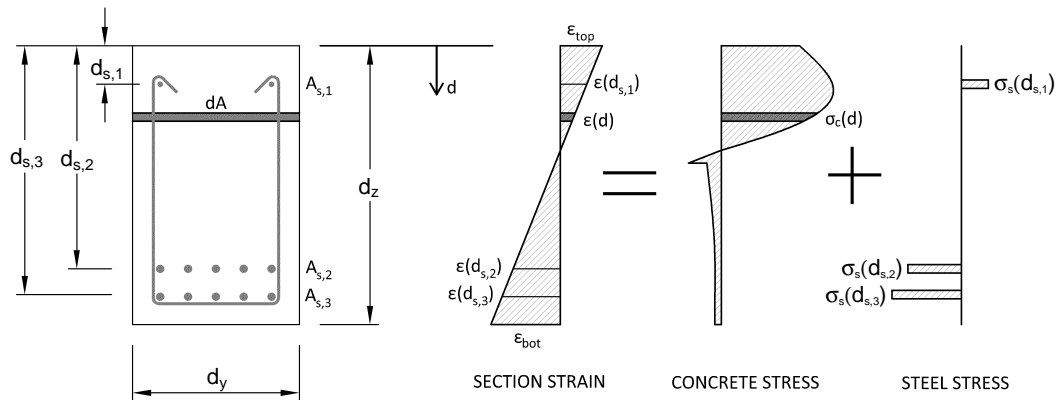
Resulting Sectional Concrete and Steel Stresses
